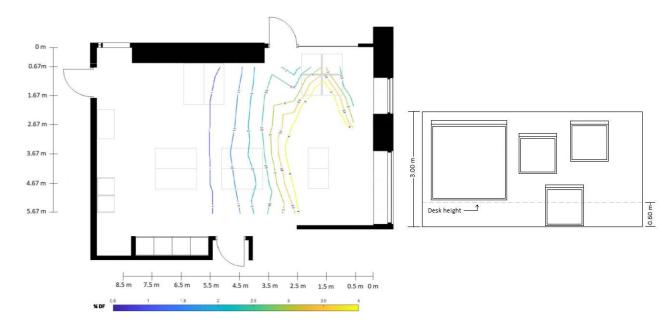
Daylight factor level [%] at 0.6m above floor level in room 1.1.05 (left). Façade window layout of the classroom as seen from outside the room (right). Glazing-to-floor-area-ratio = 15%.
